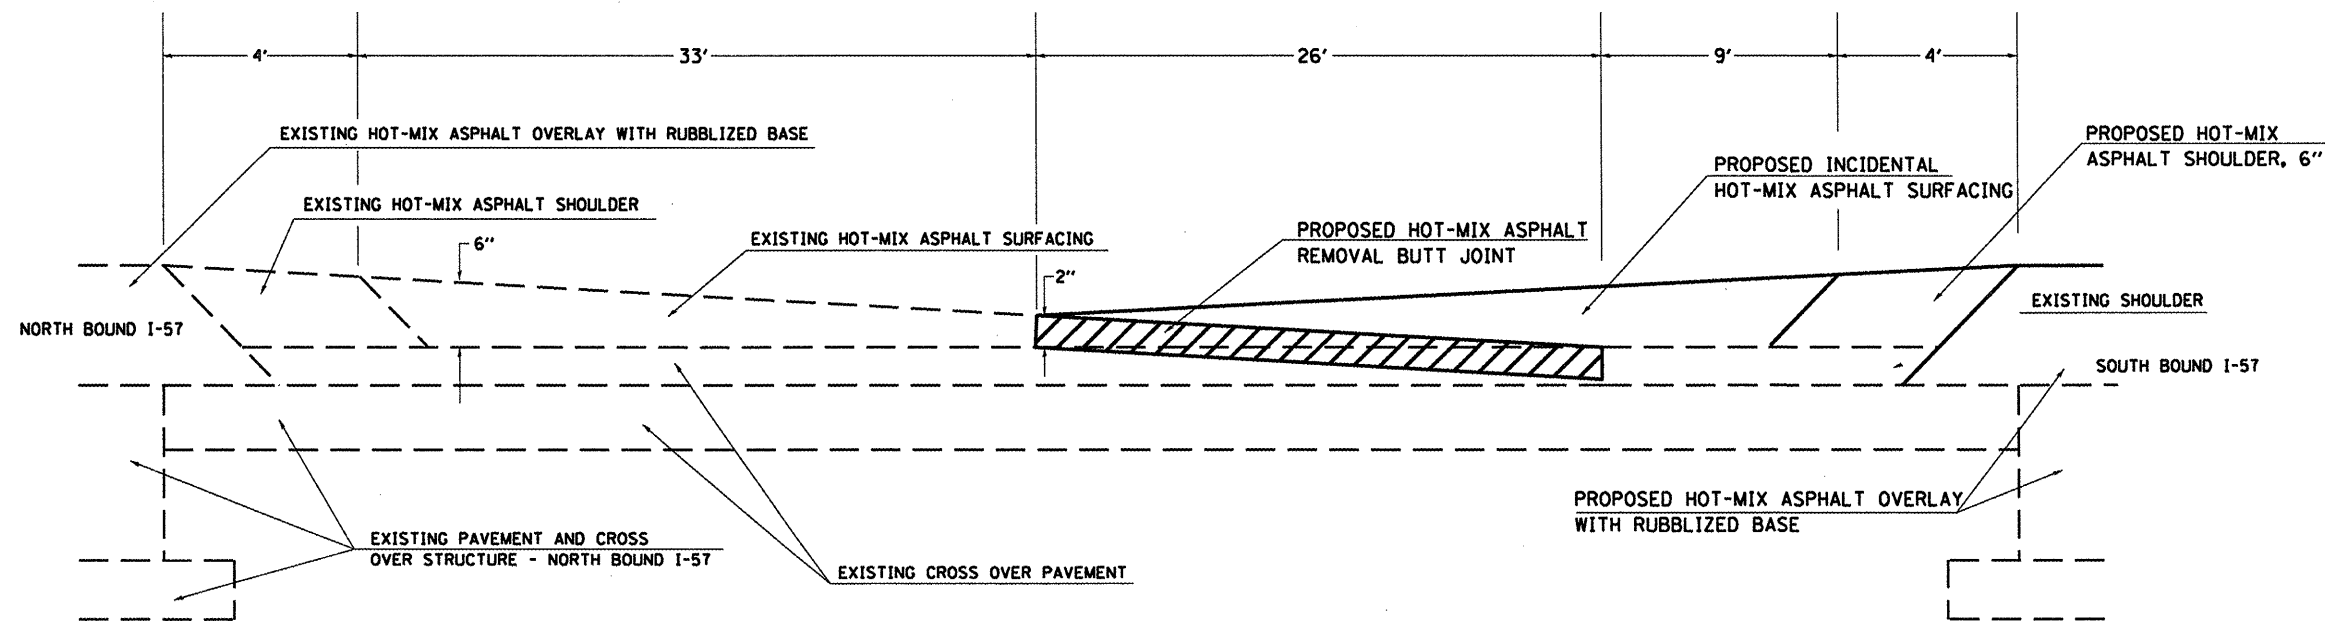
DETAIL OF MEDIAN CROSSOVER PLAN VIEW
